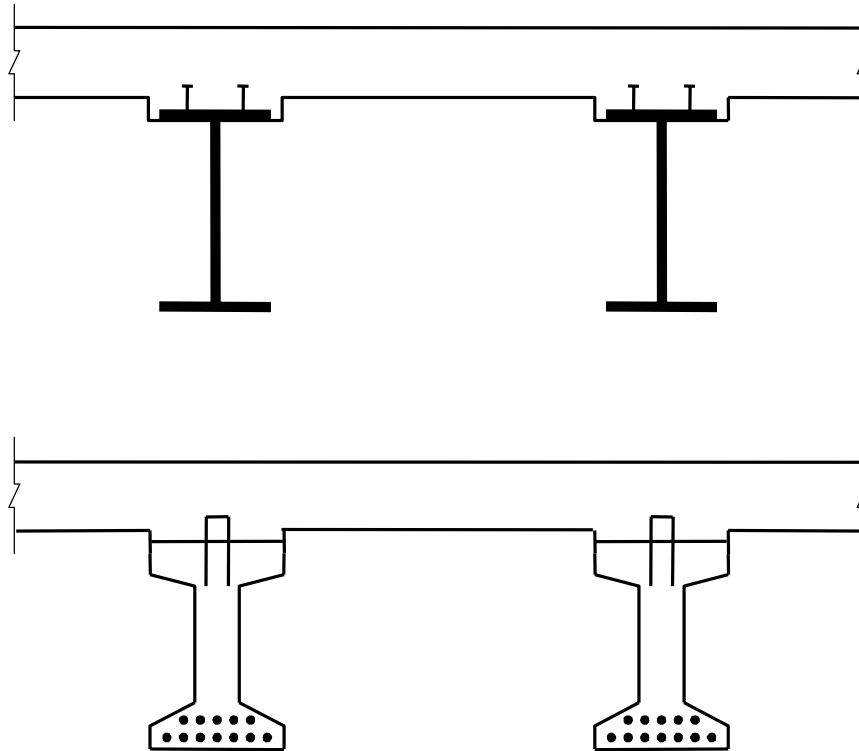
Composite Concrete Deck on Steel Beams and Prestressed Concrete Beams
